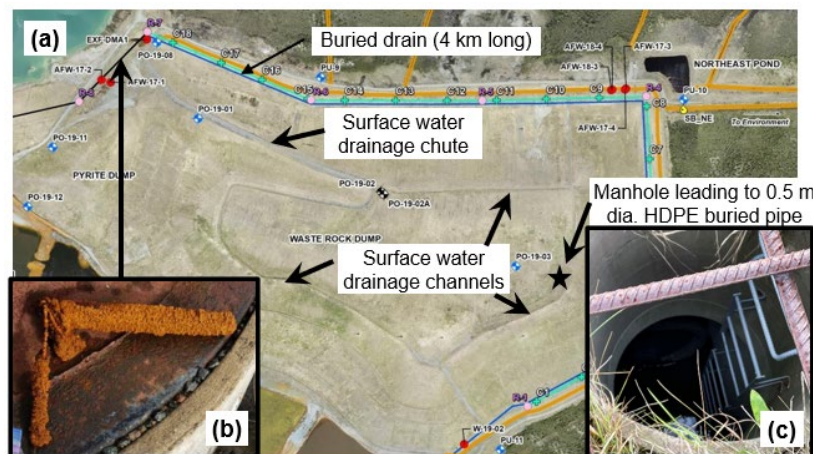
(a) Reclaimed Selbaie WRD site layout (Wood 2020); (b) Example of precipitate build-up inside buried drain (photo courtesy of BHP); (c) Manhole feeding HDPE pipe for draining WRD south plateau surface water (photo courtesy of BHP)
